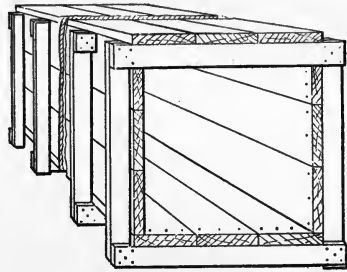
Wooden Box Culvert. Up to 4' Square, 2"×4" Stiffening Forms and 2"×12" Plank are Suitable.
